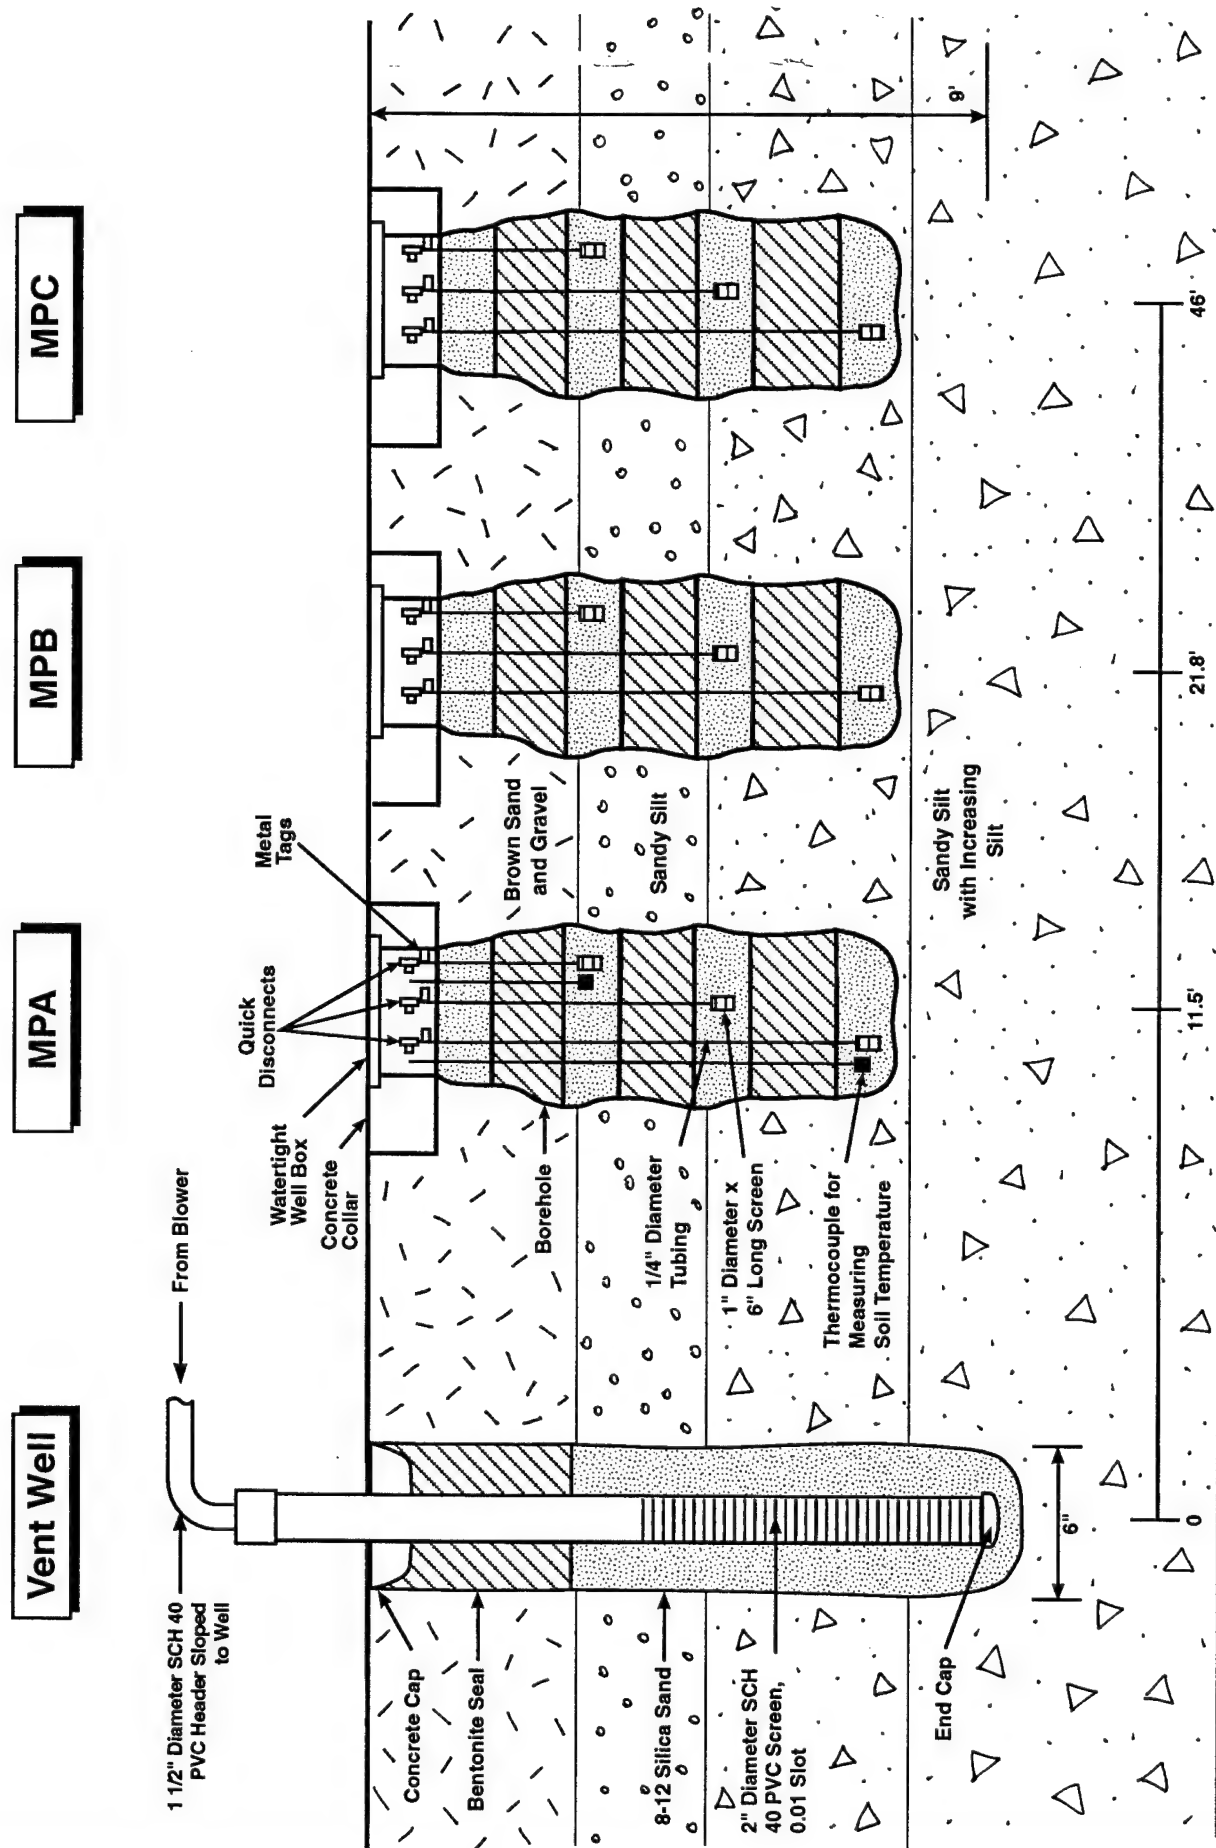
Cross Section of Vent Well and Monitoring Points at the Campion POL Tank Site Showing Site Lithology and Construction Detail (not to scale)
